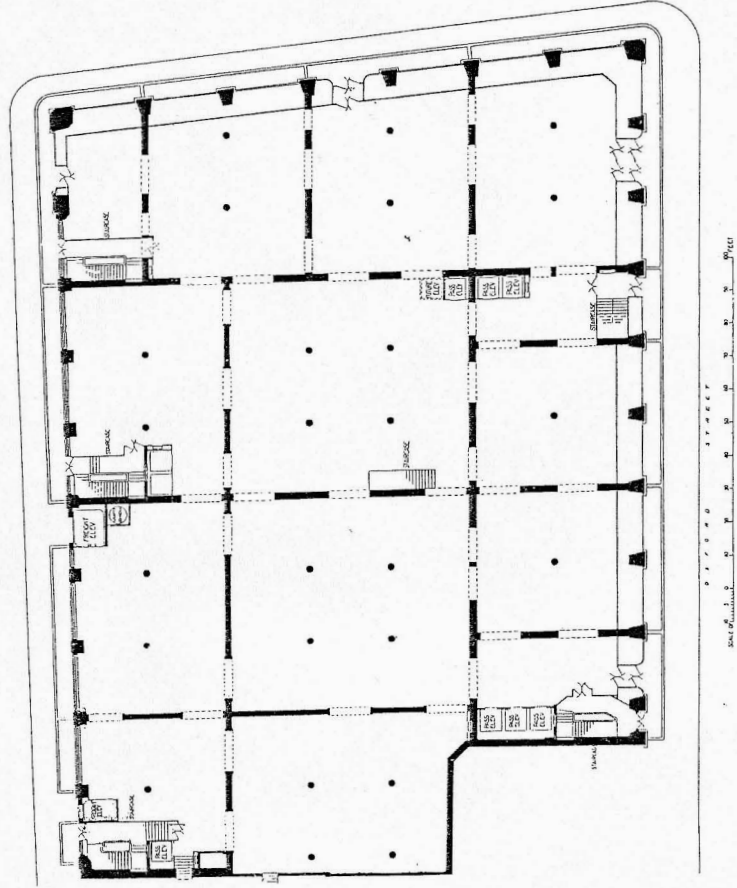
Selfridges' ground floor plan (from the *Architectural Review*, June 1909).
